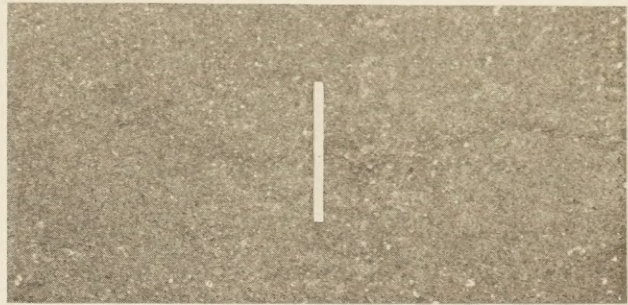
TYPICAL FINE CRACK IN A HEAVILY REINFORCED SLAB CONSTRUCTED IN THE ARLINGTON CURING TESTS, 13 YEARS AFTER CONSTRUCTION.
